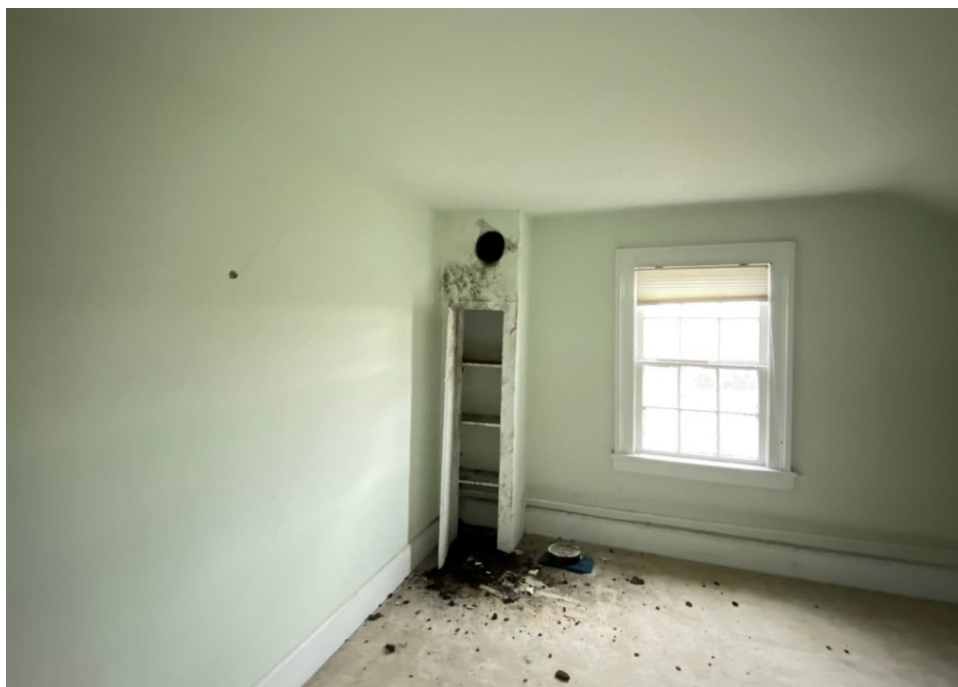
Bedroom 2 (southwest room) facing south (View Q in Figure 9)
